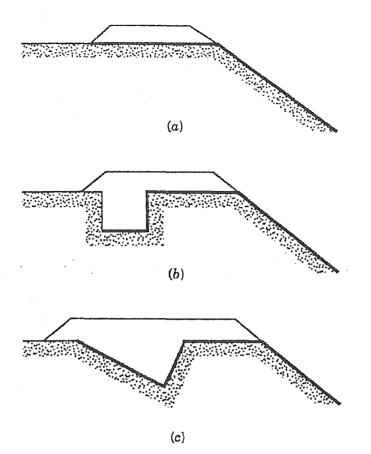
Typical anchor trench configurations: (a) flat anchor; and (b) rectangular anchor; and (c) V-shaped anchor.
